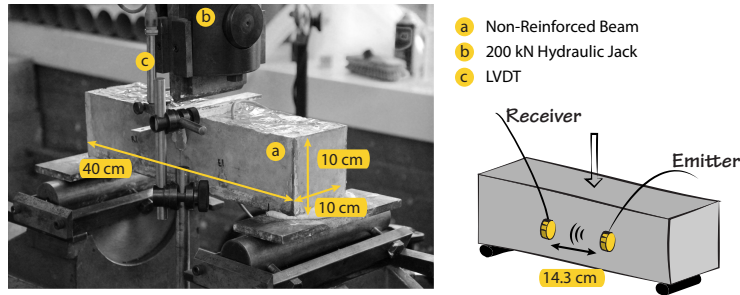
Overview of the test setup for the bending test. The geometry of the specimen is given in Table 1. The loading machine is a 200 kN hydraulic jack bending testing machine.
